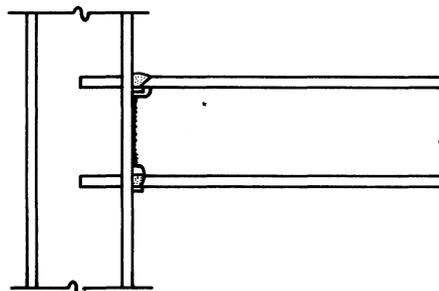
Web welds and stiffened thin column flanges also provide high restraint to contraction of flange welds.
